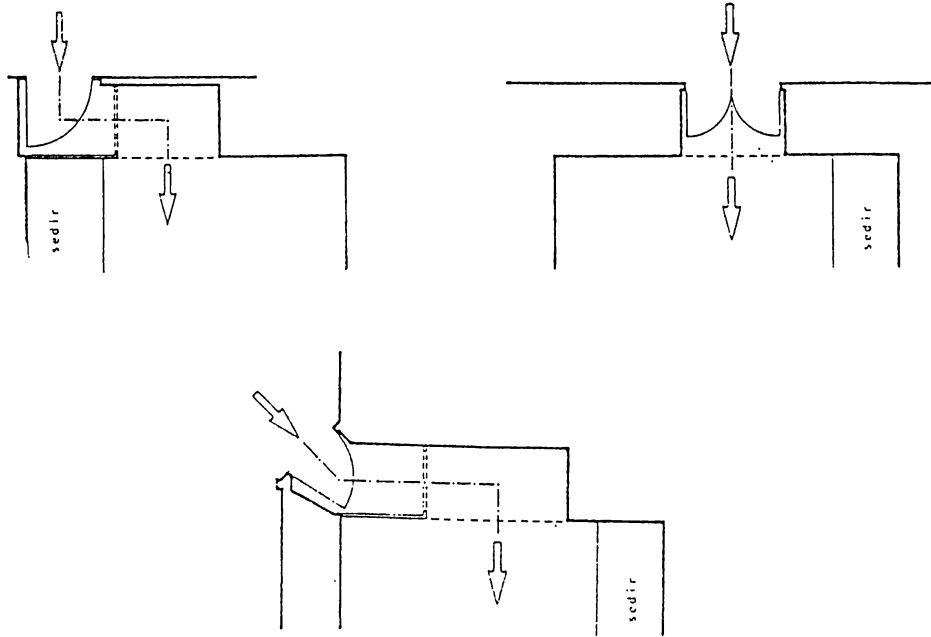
Partial plans for various design solutions for the entrance sections of the traditional rooms (Source: Günay, (1989)).
